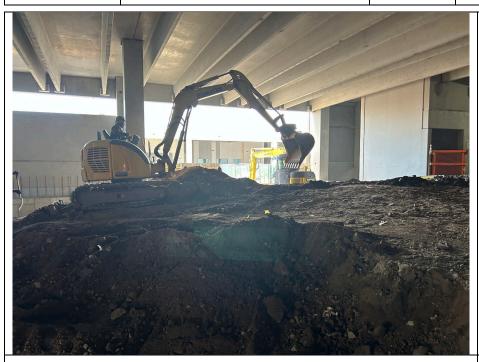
Soil movement in A1 to prepare for soil export and backfill around retaining wall poured yesterday.
